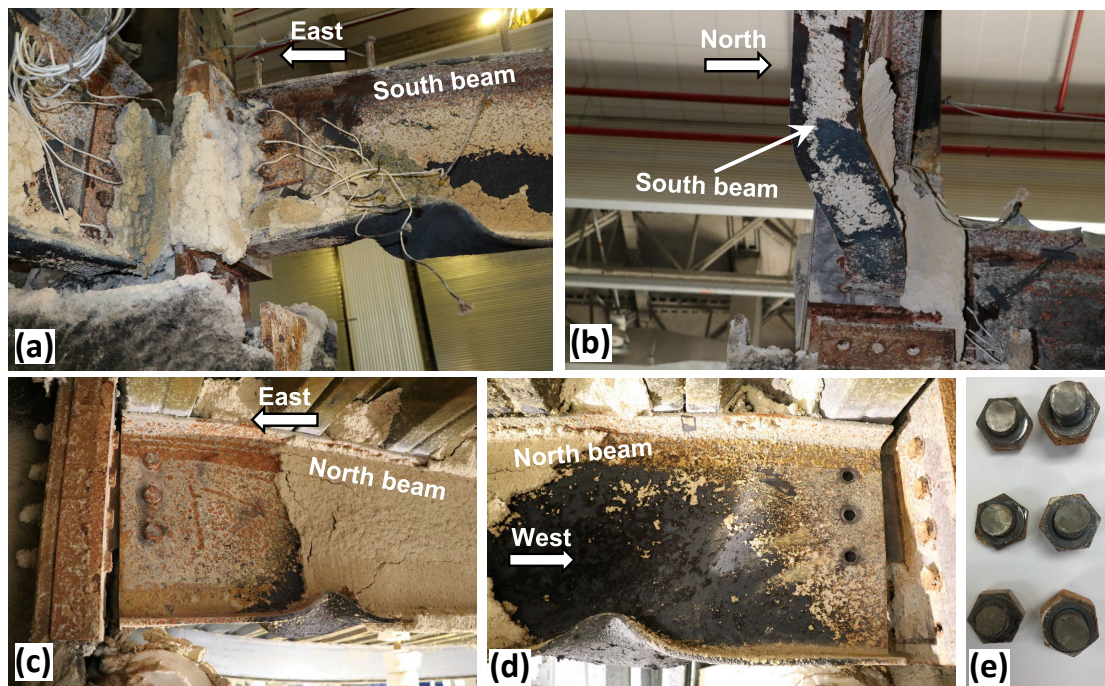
Post-test photographs of the test bay beams after steel deck removal.
